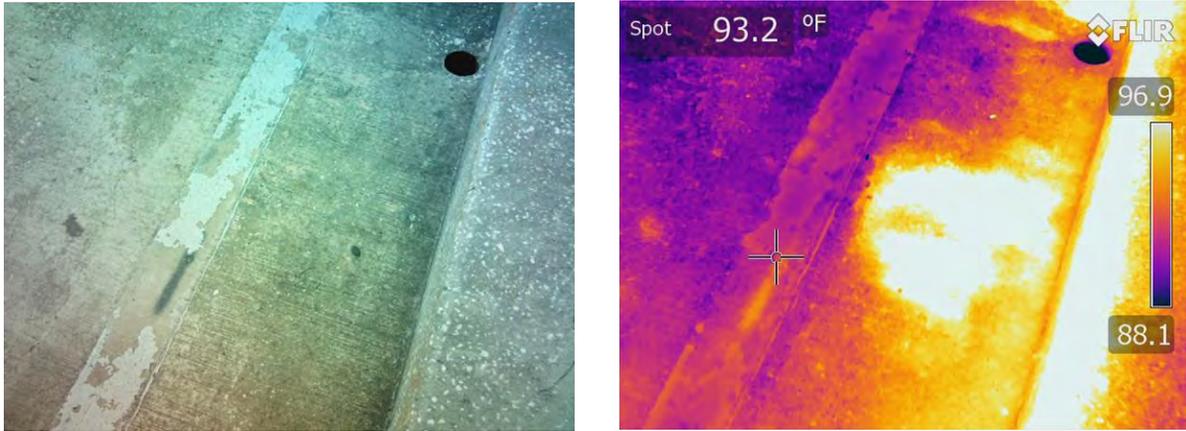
Standard and IR photos of bridge deck delamination (St. Petersburg, Florida)
